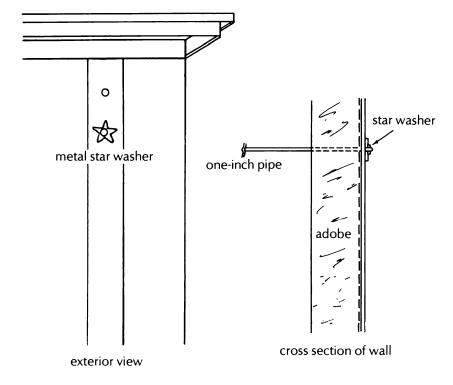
Tie-rod construction, detail, Eaton House (53).
